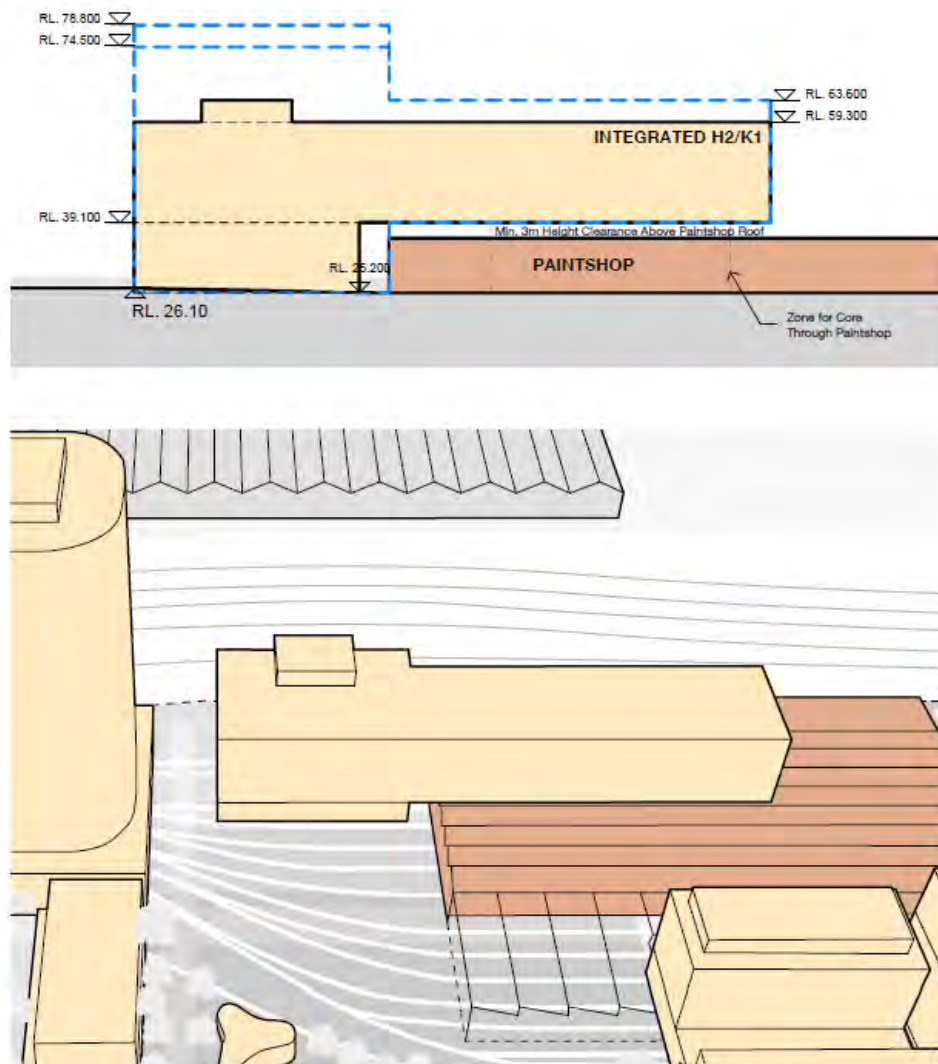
Building envelopes proposed for 'Approach 2' shows the overdevelopment structure supported by the interconnection to, and integration with Building K (Source: Bates Smart 2022;p126)
